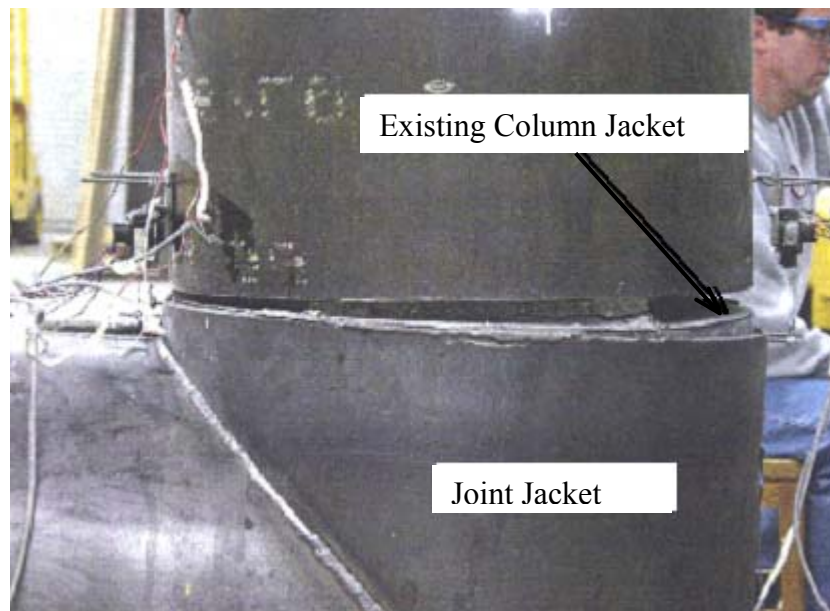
Slippage of the Existing Column Jacket Within the Joint Jacket
